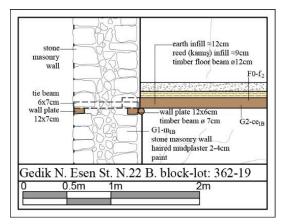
Connection detail 1-section drawing of floor beams inserted into wall along the wall plate thickness (Gedik N. b.block-lot:362-19)
